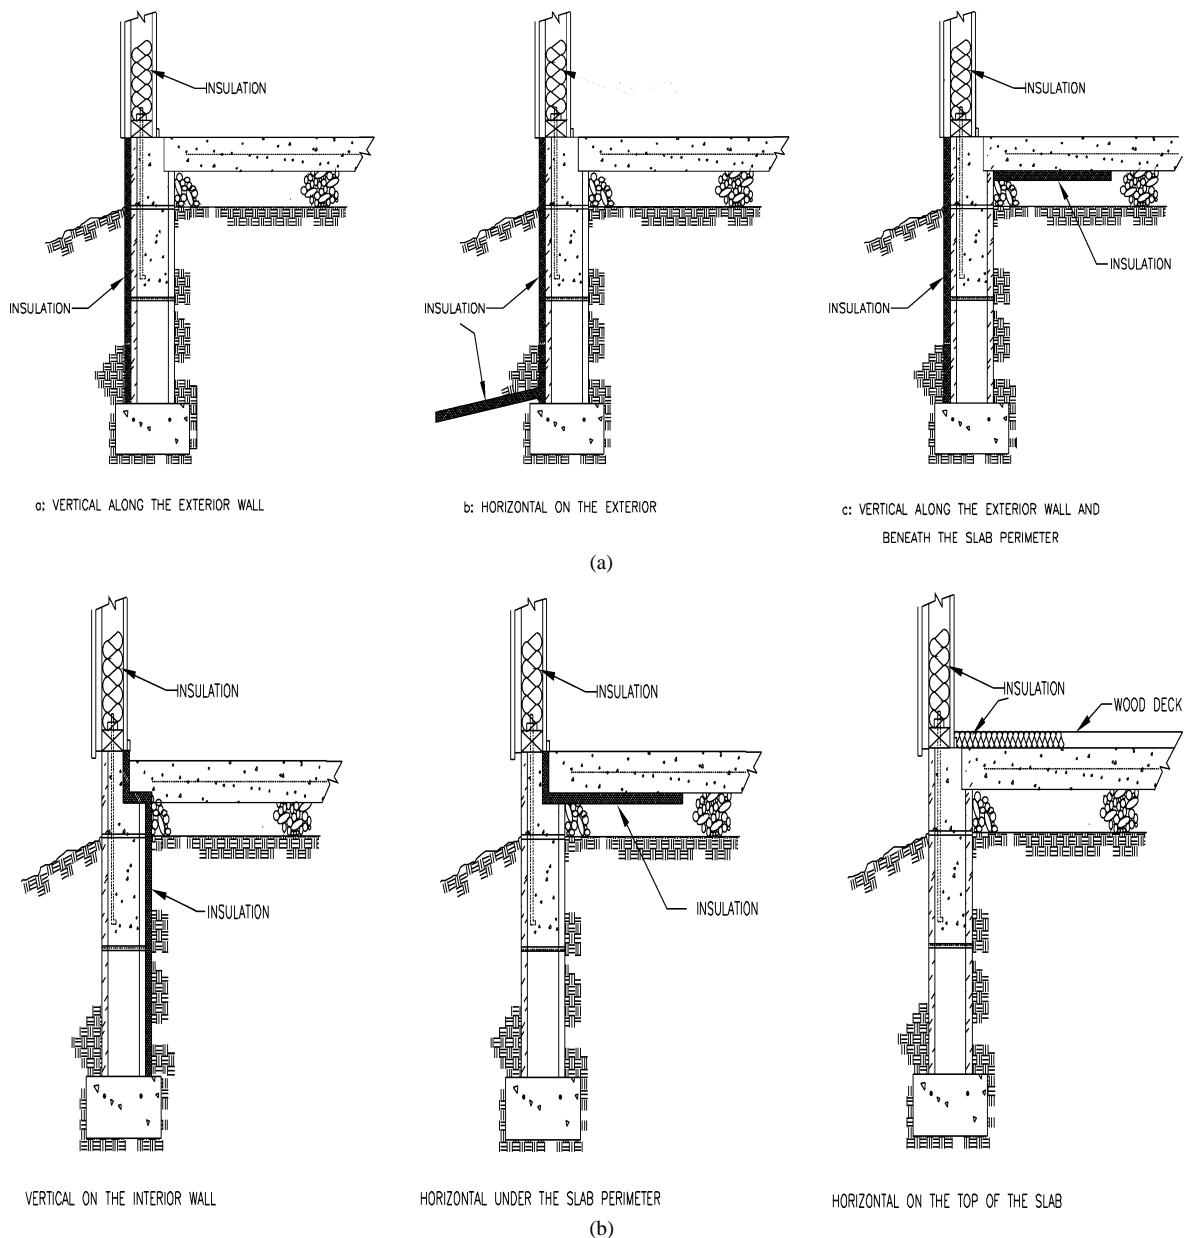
Common insulation configurations for slab-on-grade floors: (a) exterior placements, and (b) interior placements.
